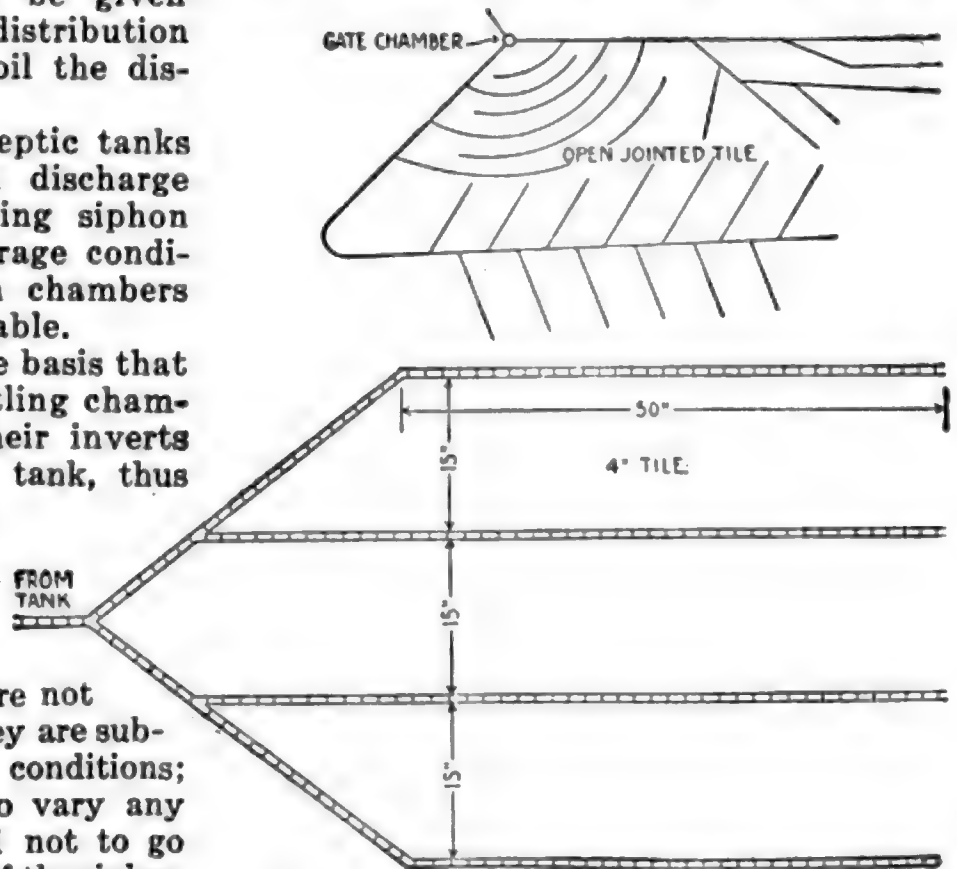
A ground plan for the laying of the tile in a system leading from a sewage disposal plant to drain the tanks underground
